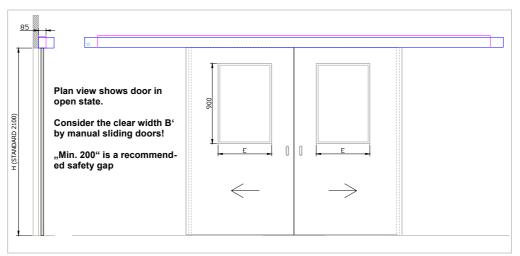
DS double-leaf symmetrical sliding door with window, front view
